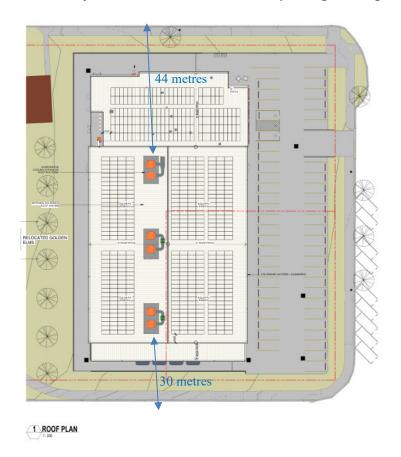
Plan Showing the Location of the Proposed Basketball Roof Top Mechanical Plant to the Nearest Residential Boundaries. Source: The Facility Design Group.
